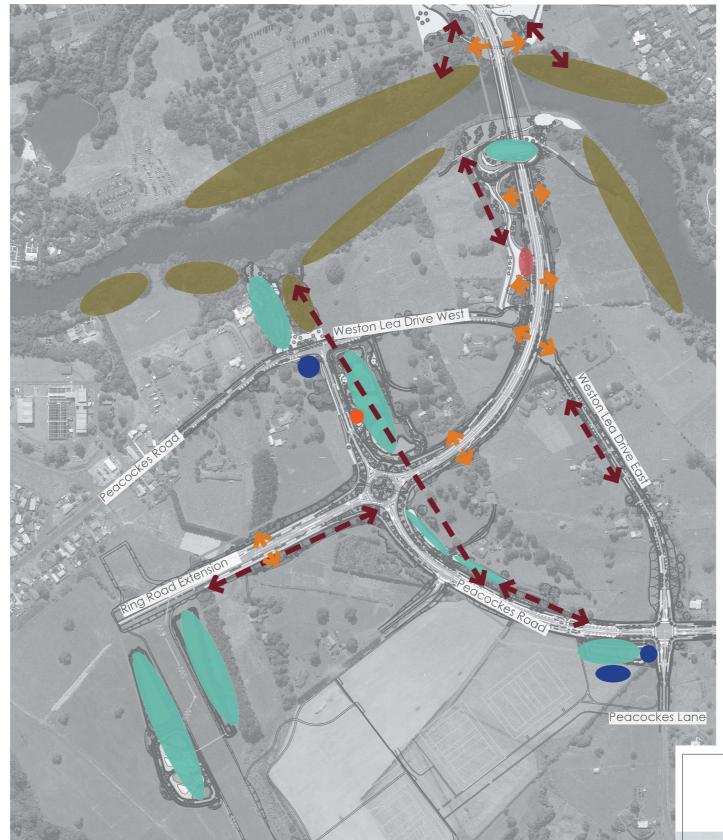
GENERAL ARRANGEMENT OF PLANTING TYPES AND AREAS
